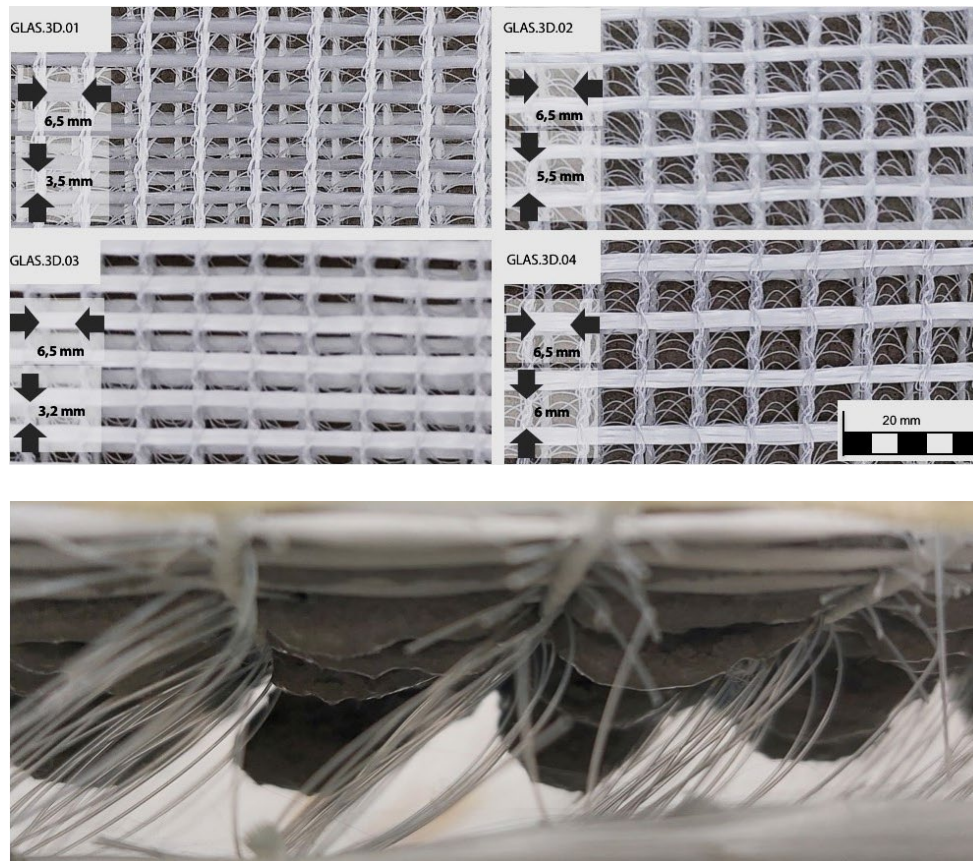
3D LDM concrete printing on 2D glass textiles; Top – Design of project-specific textile geometry; Bottom – 3D concrete print on 3D textile, section through the 3D textile; targeted penetration of different amounts of concrete allows the production of structures of different densities © FRAUAS
